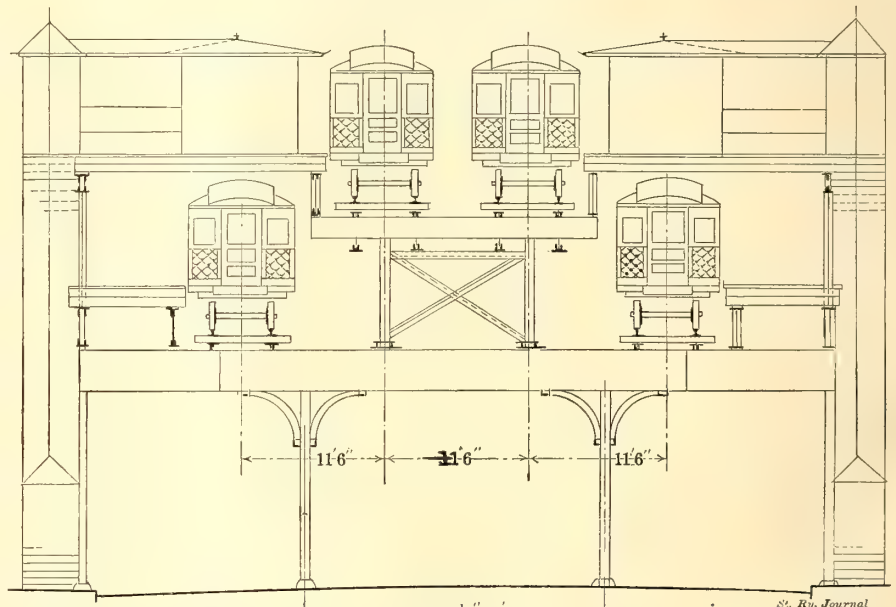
CROSS-SECTION AT 125TH STREET, ON THE SECOND AVENUE LINE
